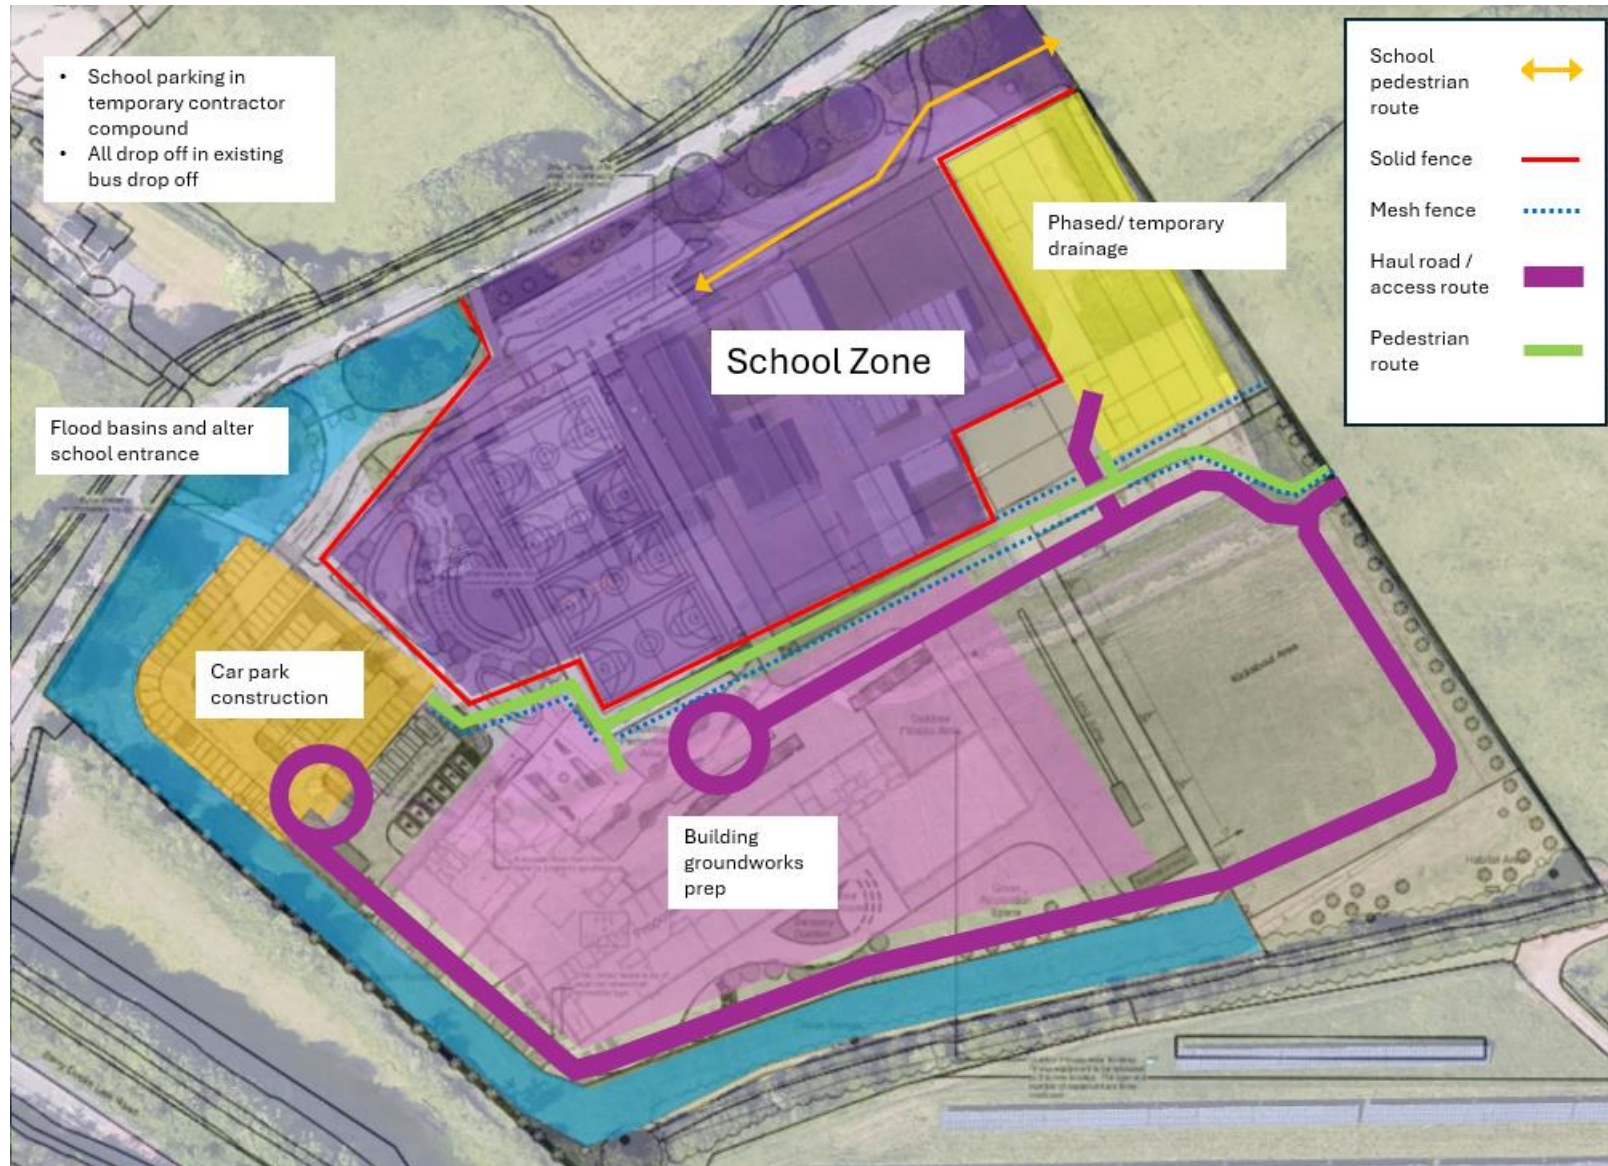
Site Logistics Plan for flood alleviation works, car park construction and groundworks for the building
